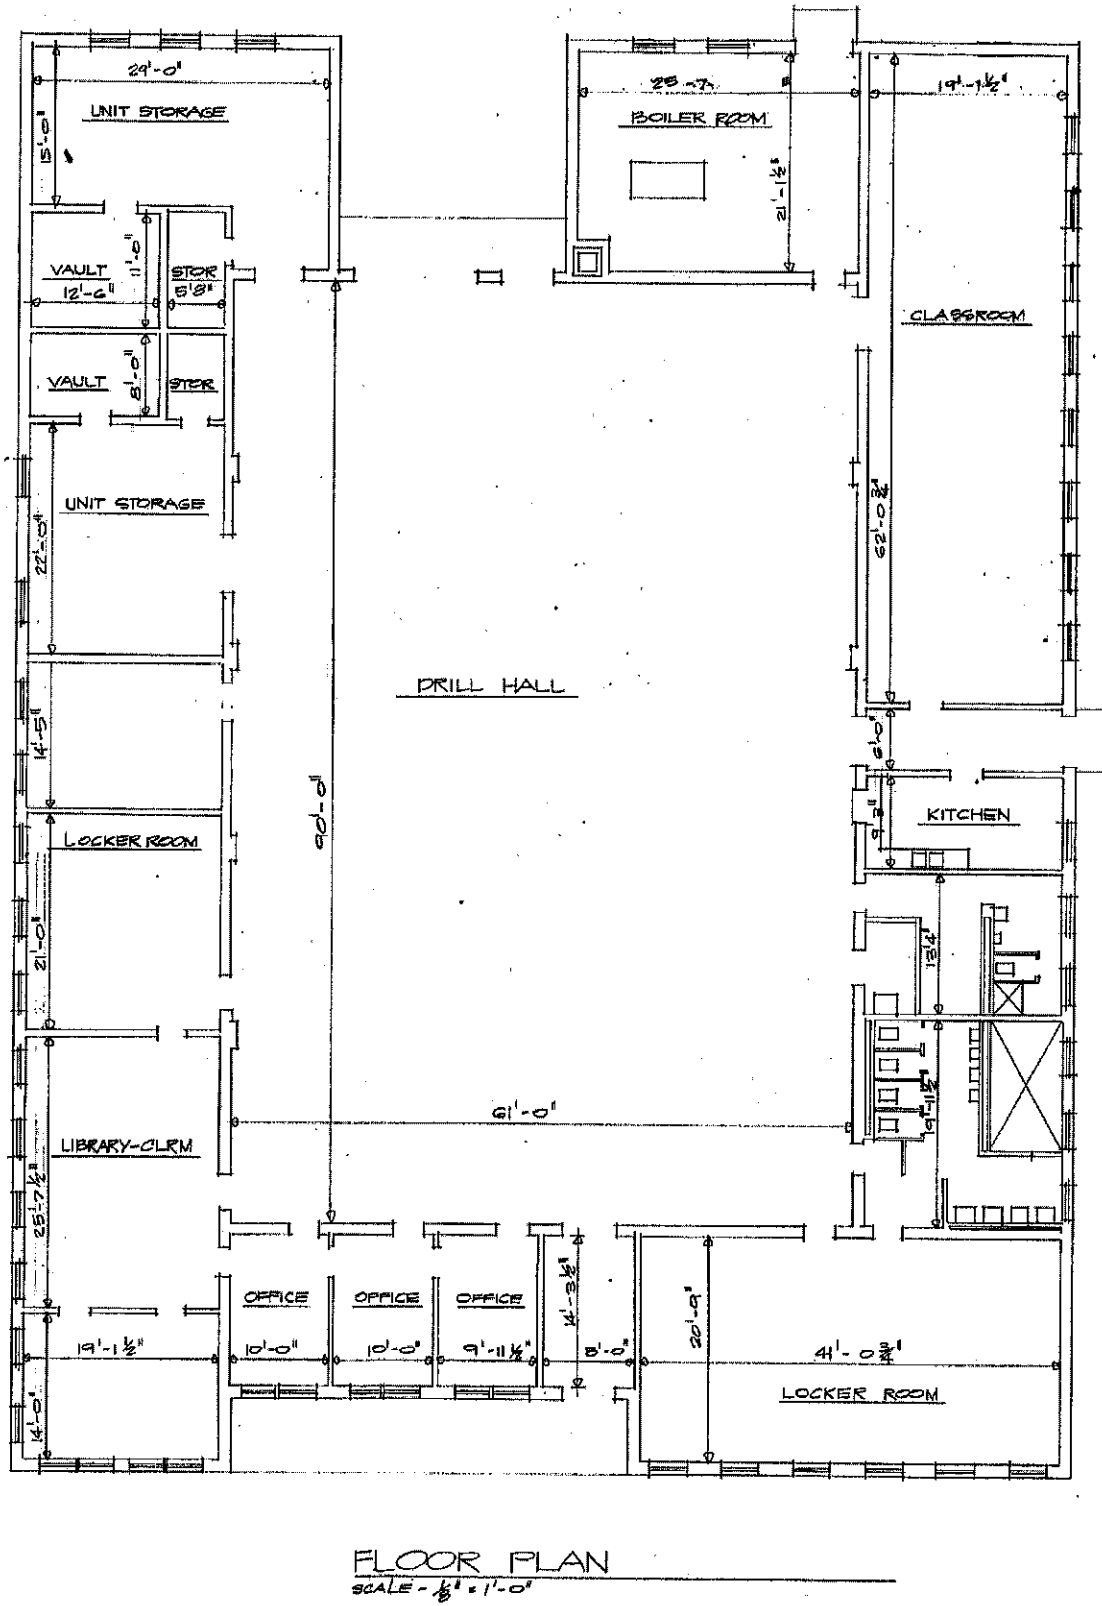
Typical Floor Plan of Reversed One-Unit Armory, North Carolina
